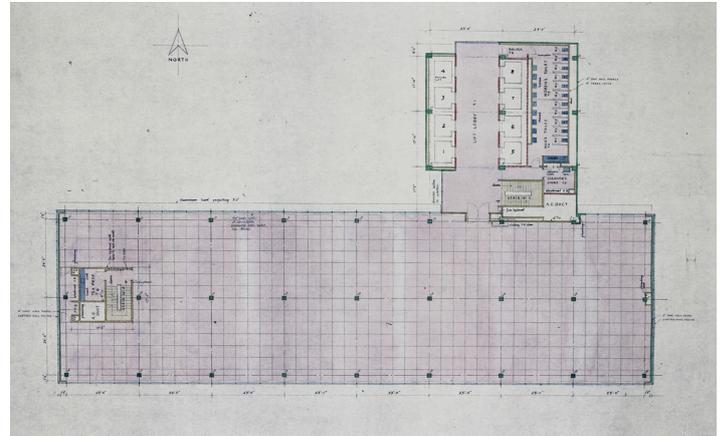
Bates, Smart & McCutcheon, ICI House, typical floor plan, dated 19 June 1956, PROV, VPRS11200/P0001, Unit 1718, Building Application no. 30056, Sheet no. P329, amendment C, 4 October 1956.
